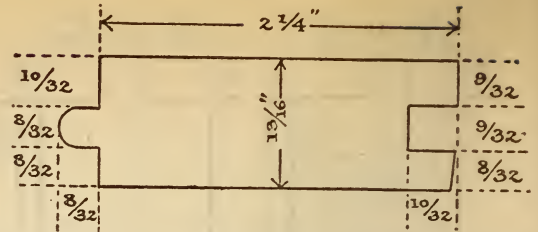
1 by 3 inch kiln-dried flooring, green, 2⅜-inch face
